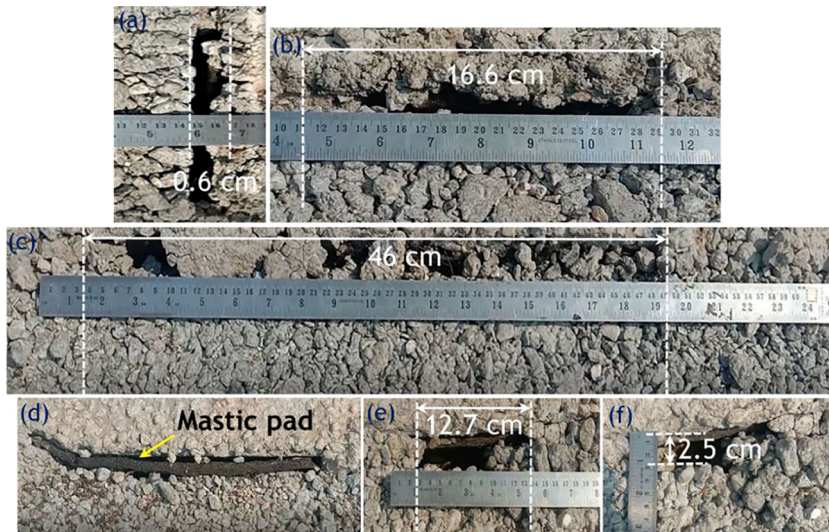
Deteriorated joints at the junction of pervious concrete pavement and Portland cement concrete pavement shoulders: (a) width at slab 11; (b) length at slab 11; (c) length at slab 13; (d) visible mastic pad; (e) length at slab 25; and (f) width at slab 29.
